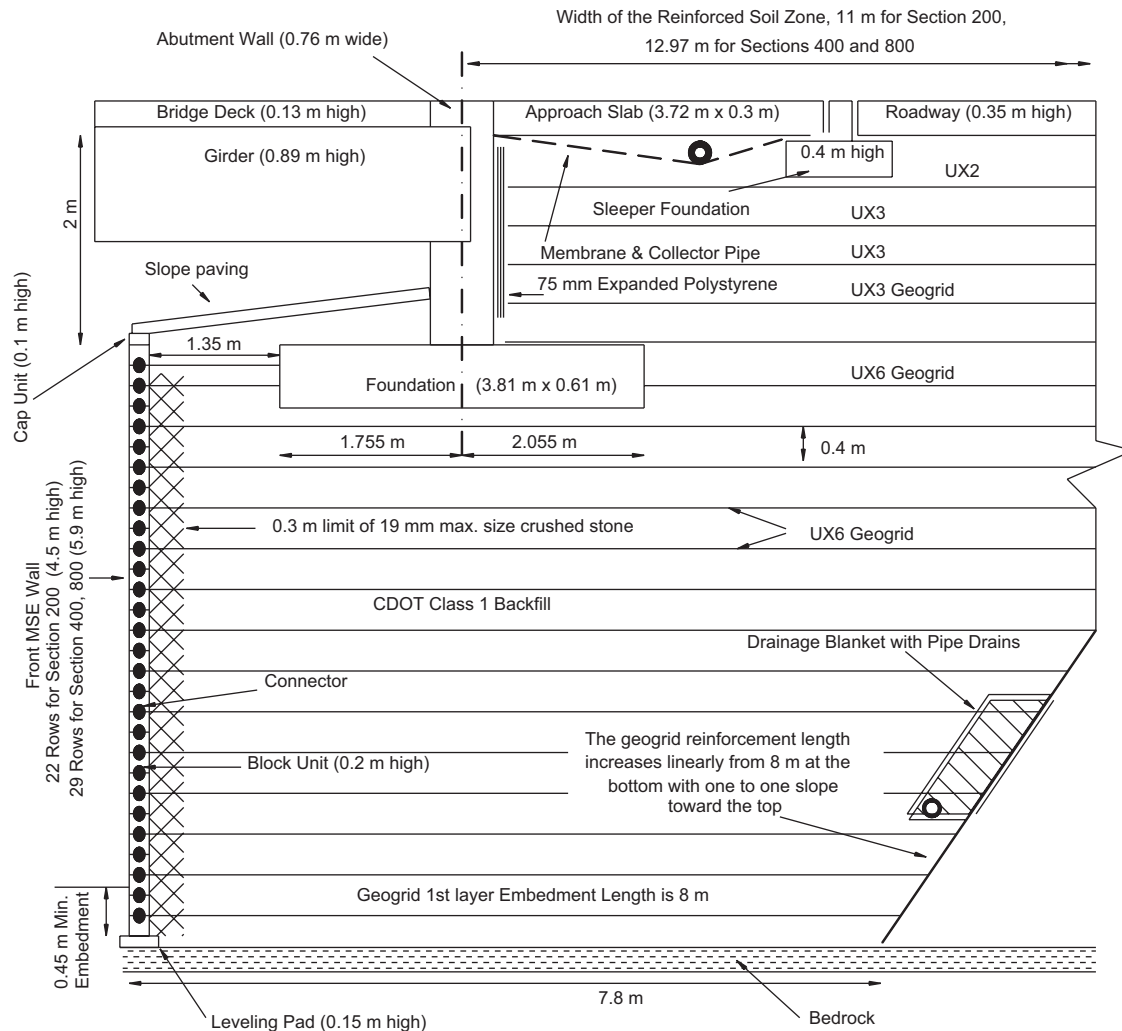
Typical cross-section of front and abutment walls, the Founders/Meadows bridge abutments (Abu-Hejleh et al., 2000).
